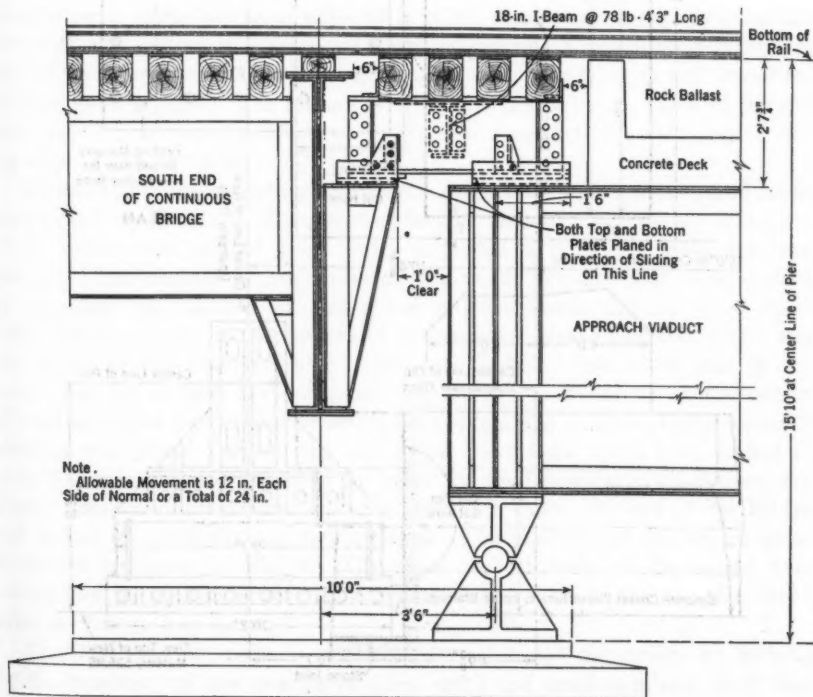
SECTION OF EXPANSION JOINT AT SOUTH END OF BRIDGE
